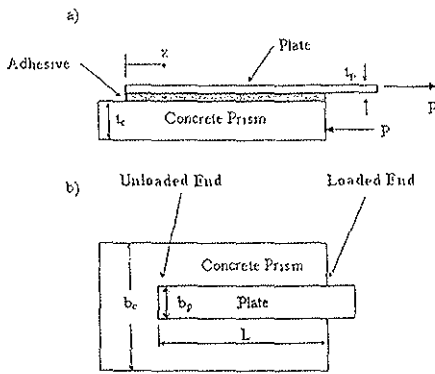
Schematic Diagram of Pull Test Set-up (a) Elevation (b) Plan
